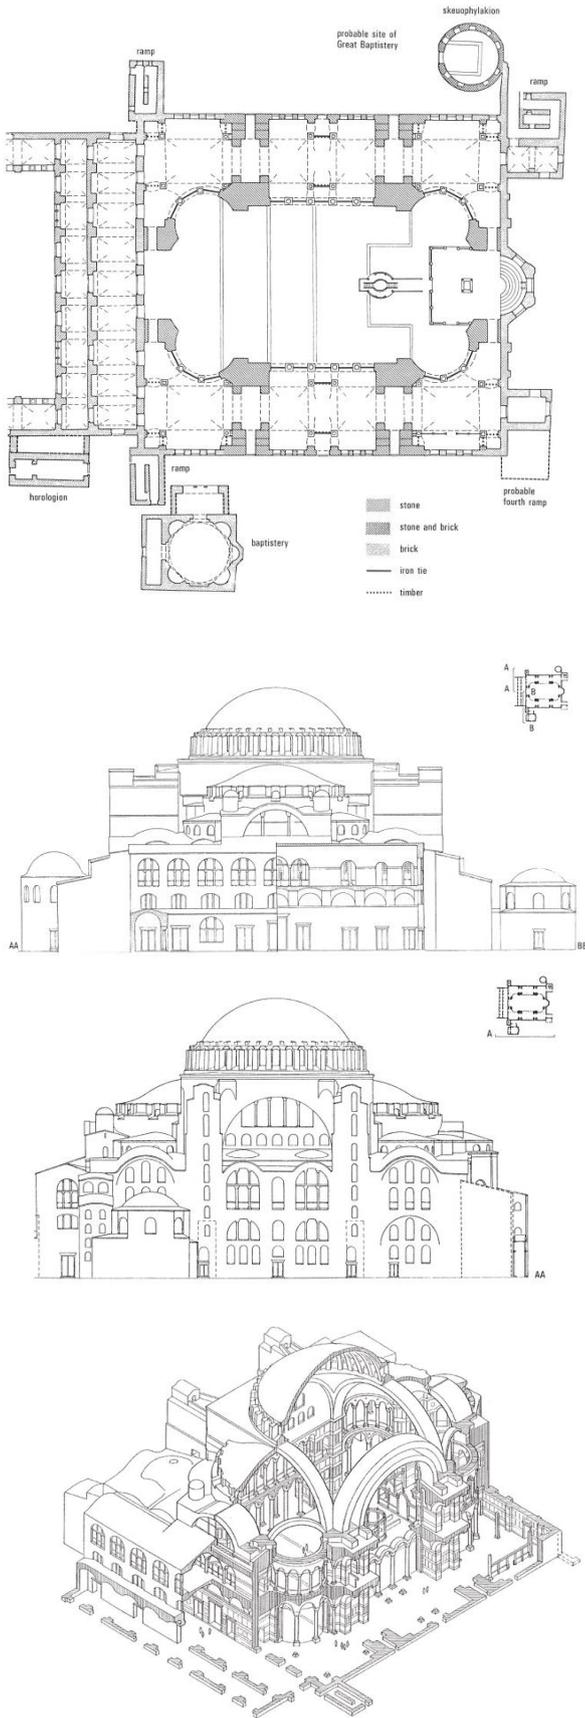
Plan, elevation, section and axonometric views of Hagia Sophia (12)
